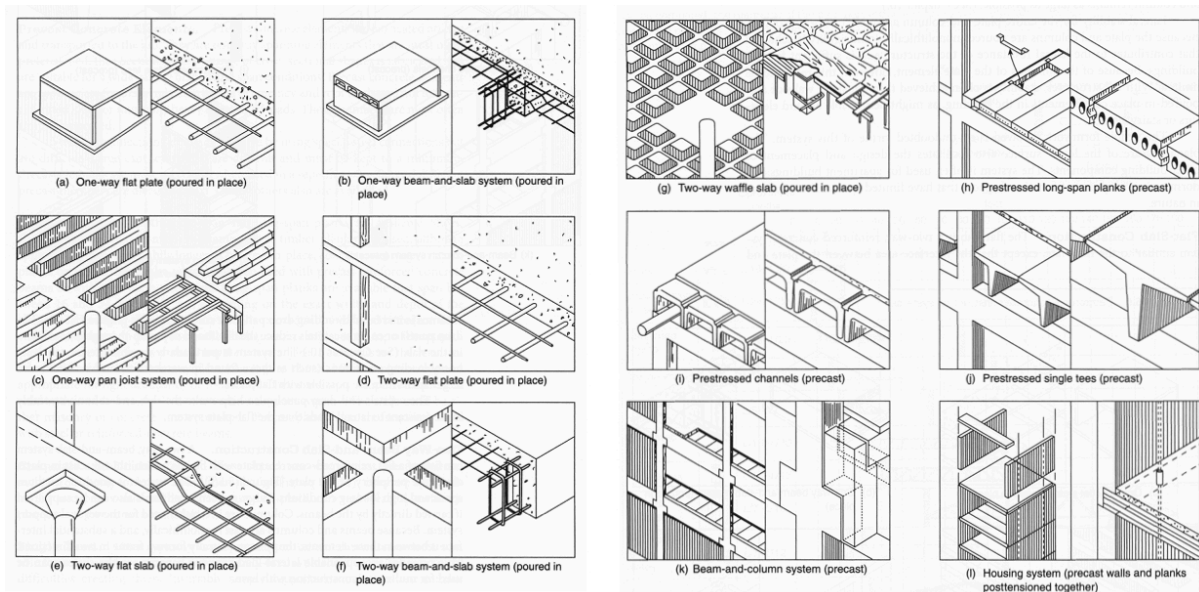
Types of Concrete Construction. *Structures*, Schodek/Bechthold. Figure 15.5 pp491-2
